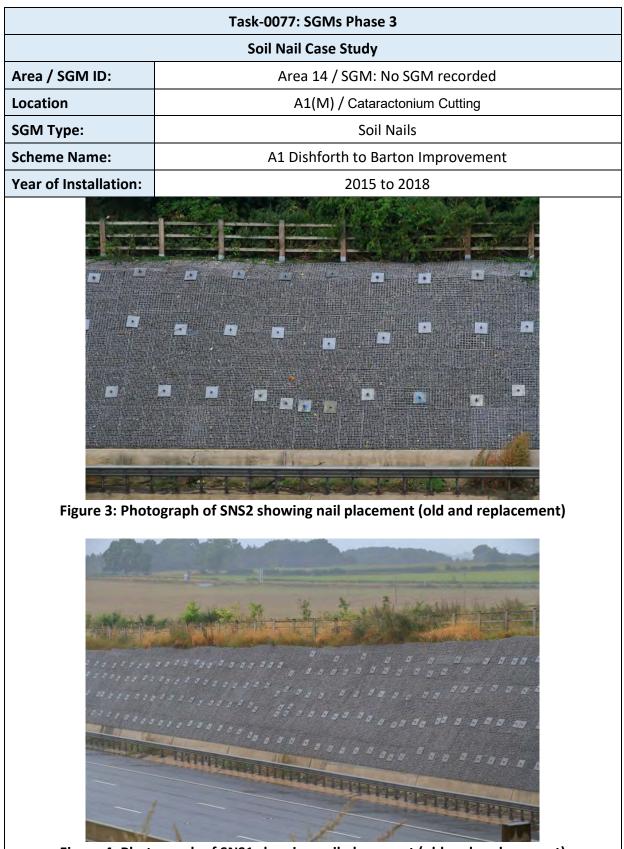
Photograph of SNS1 showing nail placement (old and replacement)
